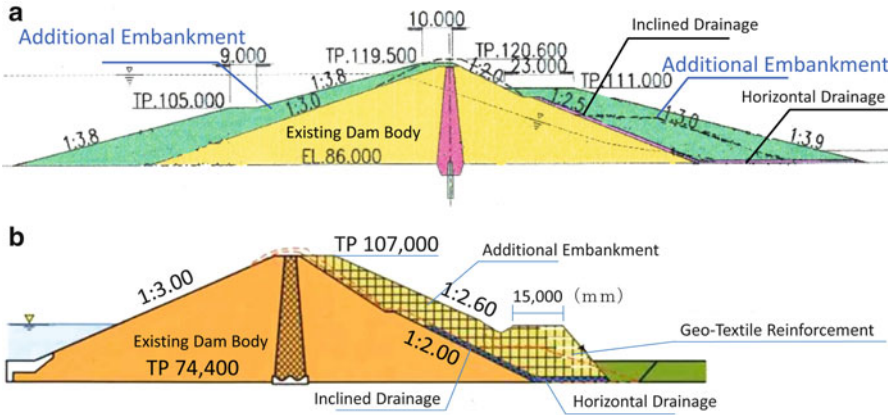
Reinforcement of earth dams (Tokyo bureau of waterworks). (a) Yamaguchi reservoir (additional embankment). (b) Murayama reservoir (additional embankment and geo-textile reinforcement)
